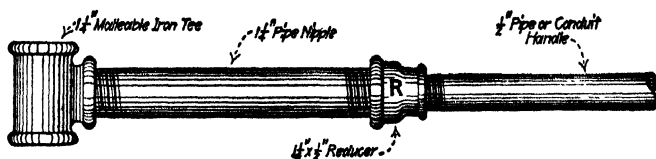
Pipe-tee hickey with working-end fittings of $1\frac{3}{4}$ in. size, and a handle of $\frac{1}{2}$ -in. conduit or pipes.
